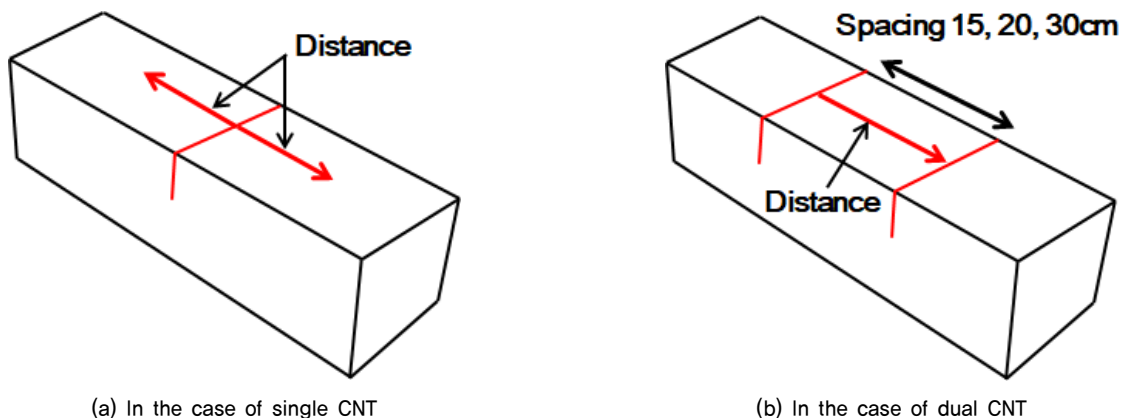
Schematic drawing of CNT embedded into concrete slab
